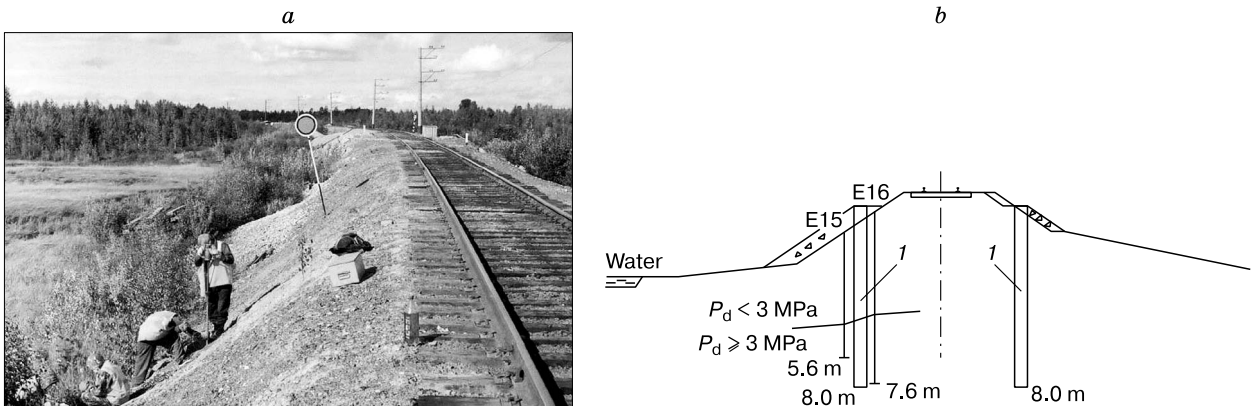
EDP inspection of deforming subgrade slopes (a) and goffer retaining structures (1) installed for subgrade stabilization (point PT 3358+56, Sverdlovsk railway) (b).
